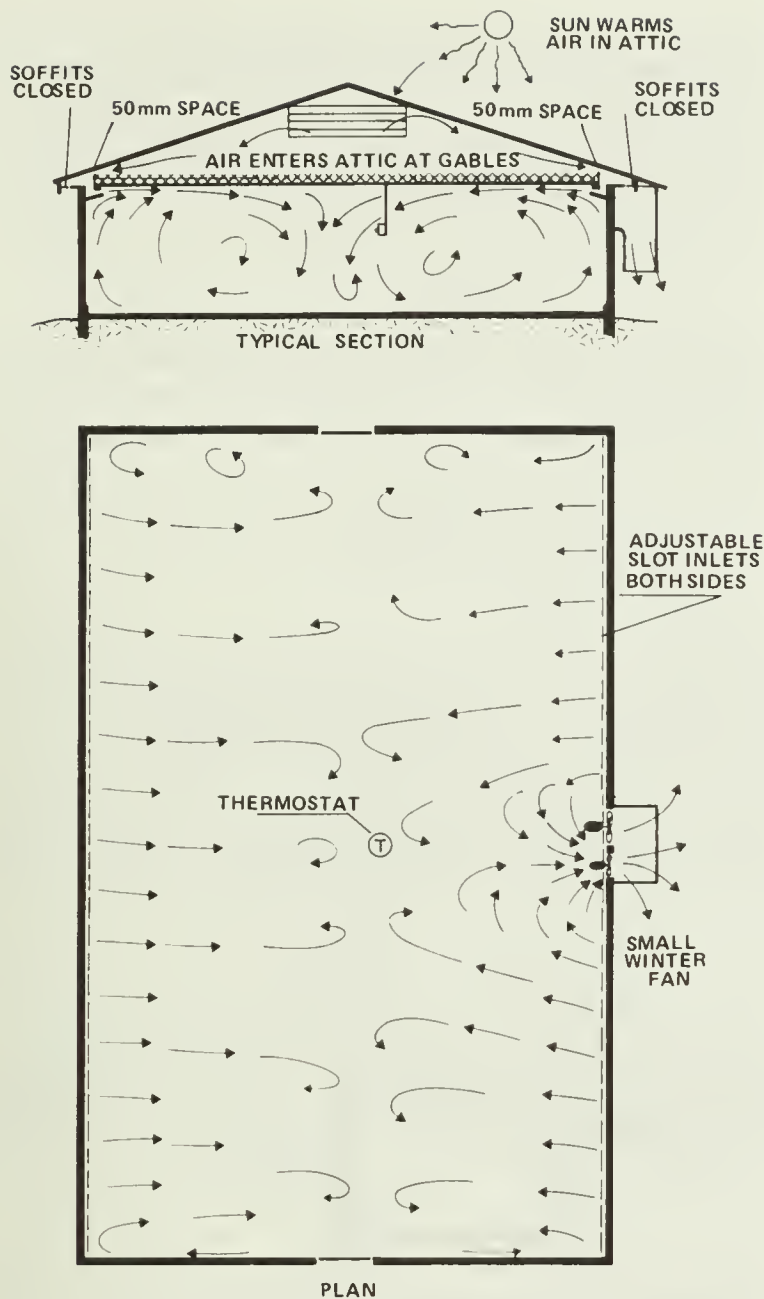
Air circulation patterns with sidewall slot inlets adjusted for fall, winter, and spring ventilation.
